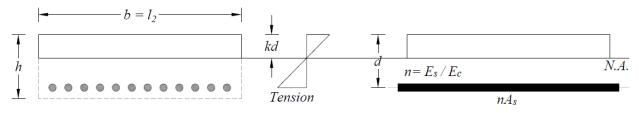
Cracked Transformed Section (Positive Moment Section)
